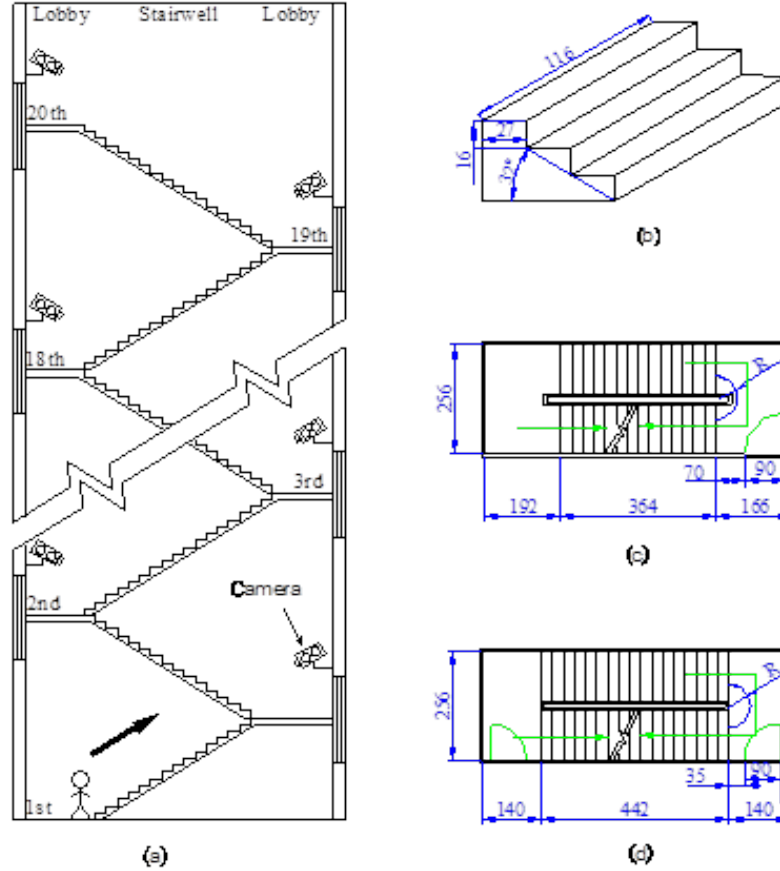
The dimension of the staircase in the study: a Section diagrammatic of stairwell; b Size diagrammatic of step (Unit: cm); c Plan of stairwell 1-2 (Unit: cm); d Plan of stairwell2-20 (Unit: cm).
